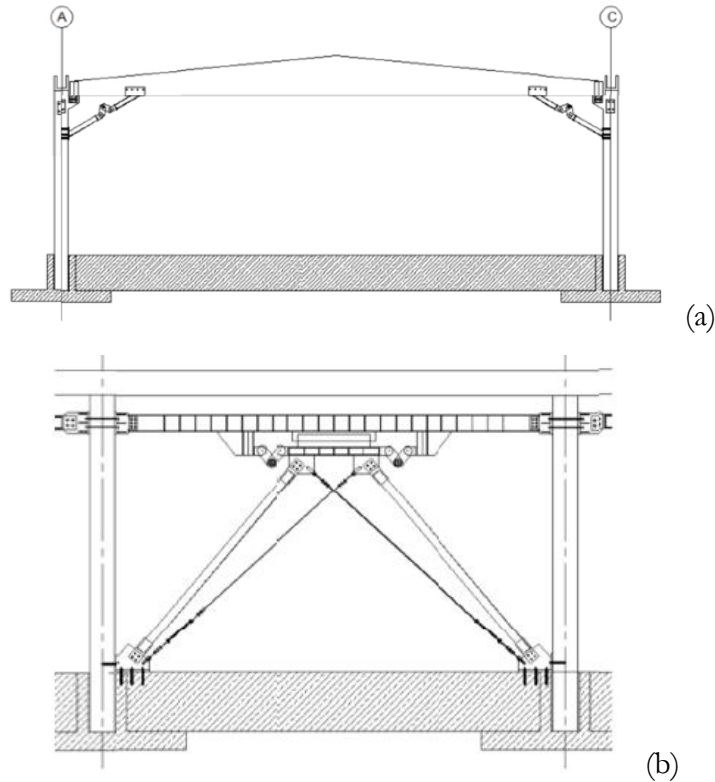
Application of friction dampers and steel members to precast structures (Yildirim et al. 2015)
